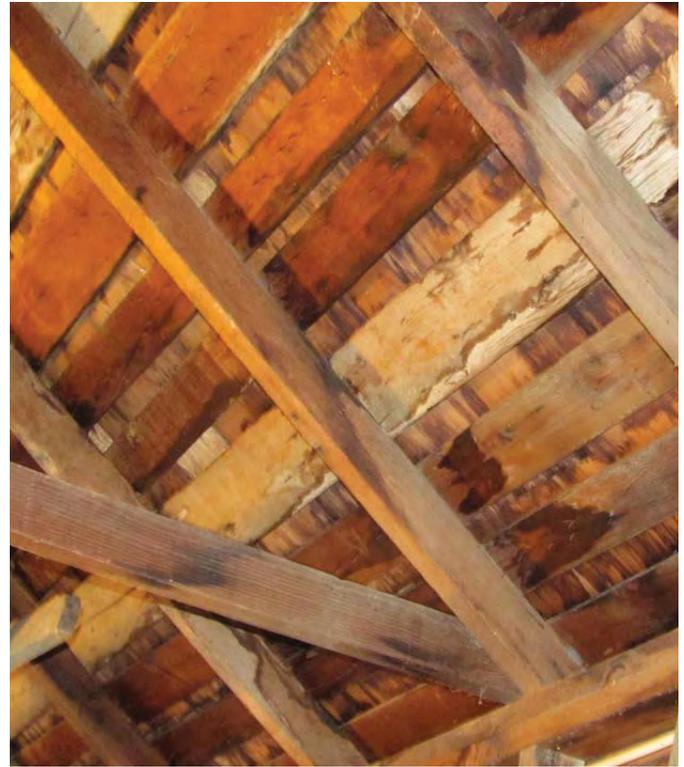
Figure B - Example of roof structure needing further evaluation when roof sheathing added.
